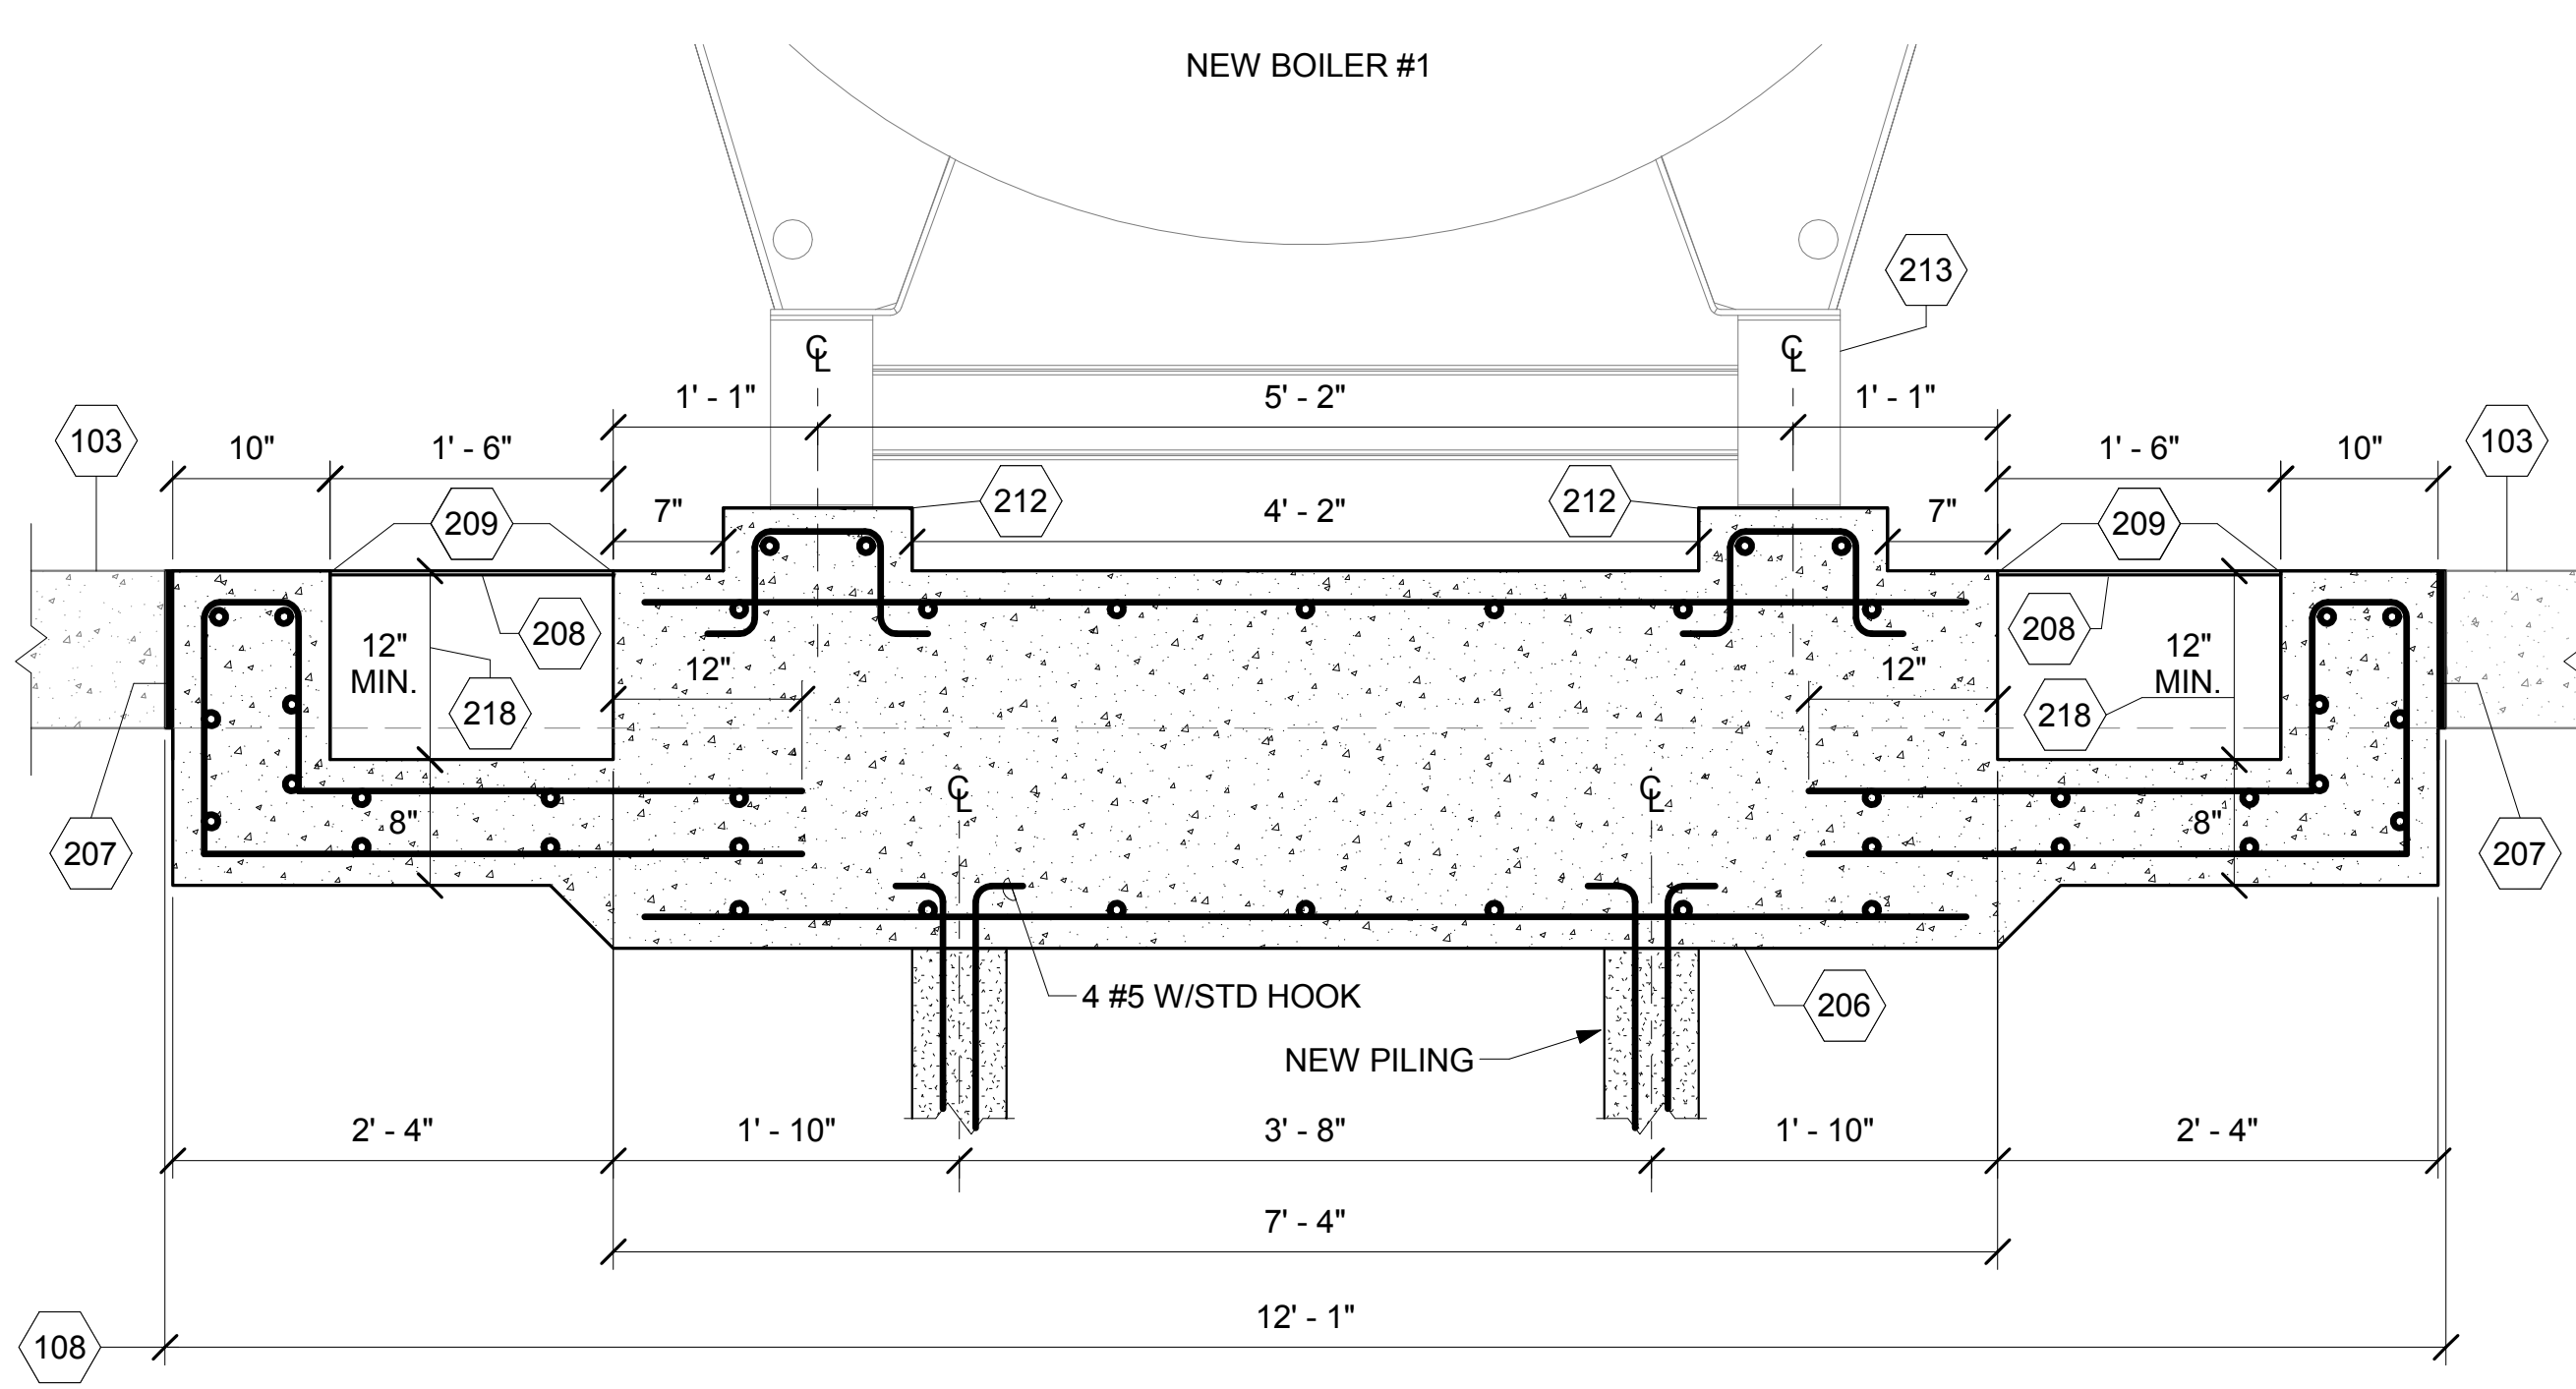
DETAIL - TYPICAL NEW PILE REINFORCEMENT
